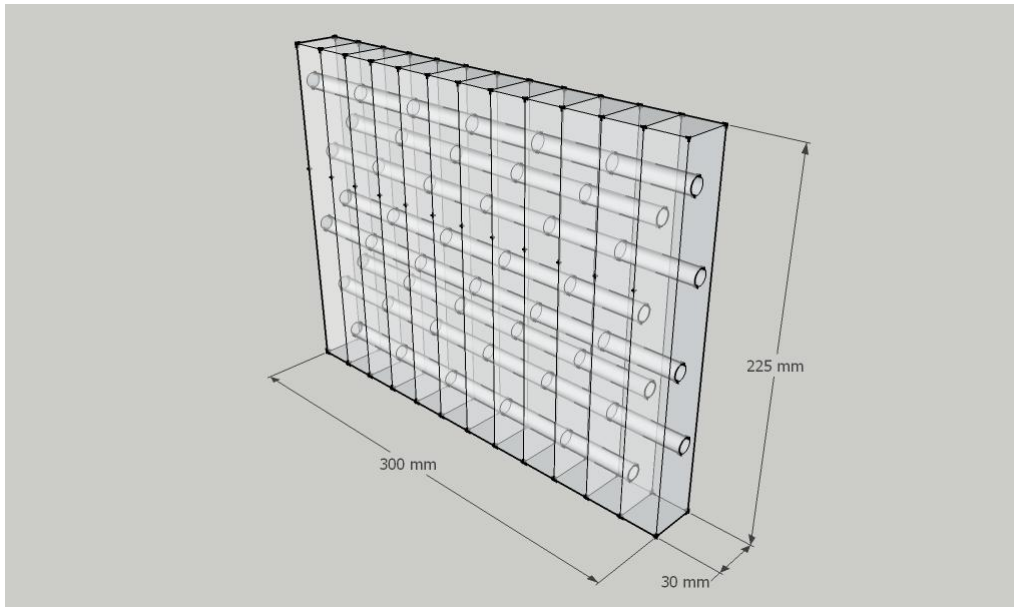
Scheme of a dowel-welded panel (Belleville et al., 2012 [9])
